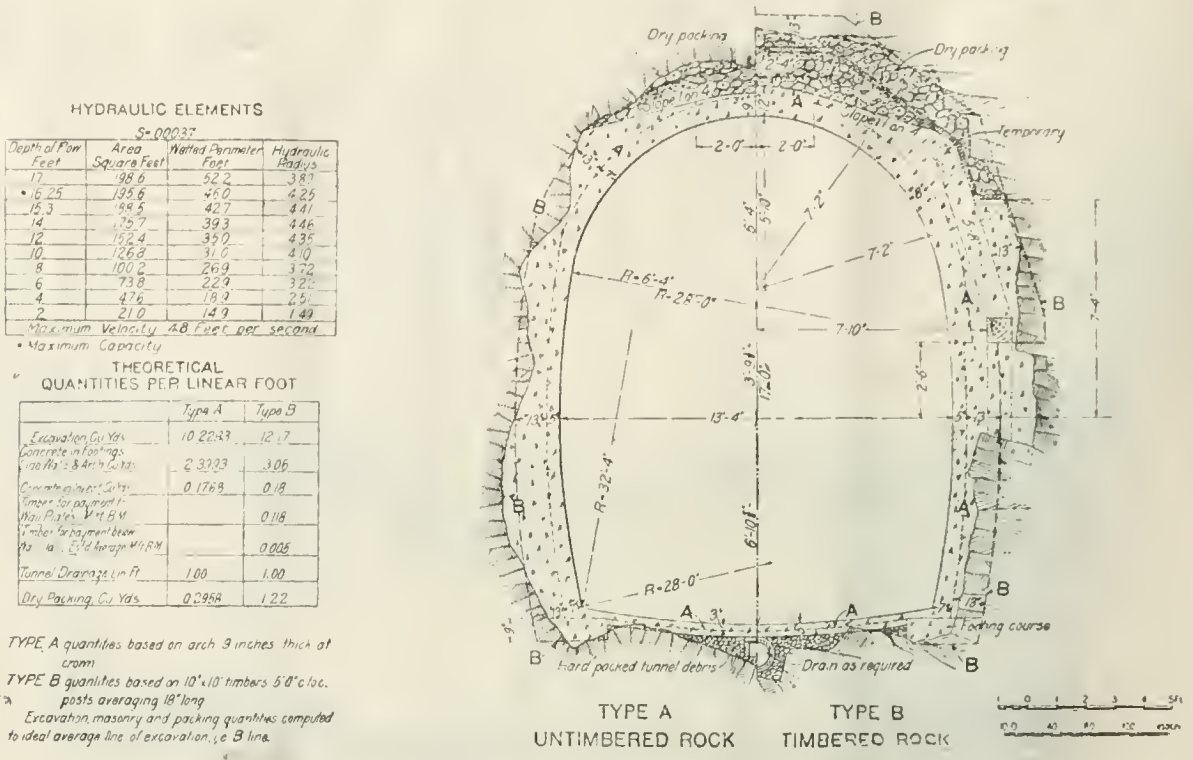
TYPES OF CONSTRUCTION OF TUNNEL AT HYDRAULIC GRADE.
